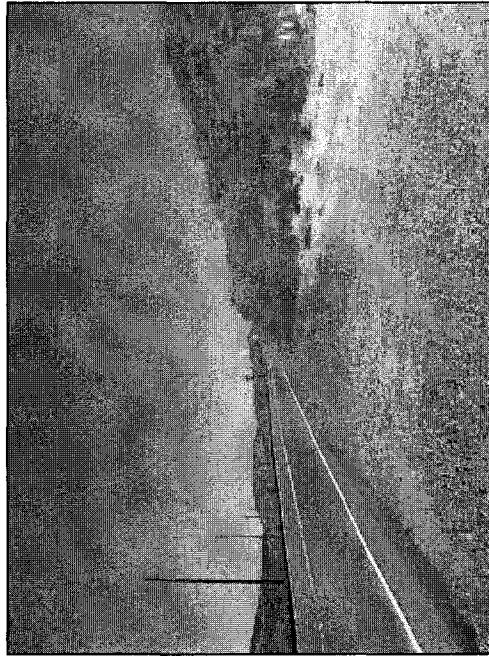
Overview of existing access road and proposed power alignment, facing north.
